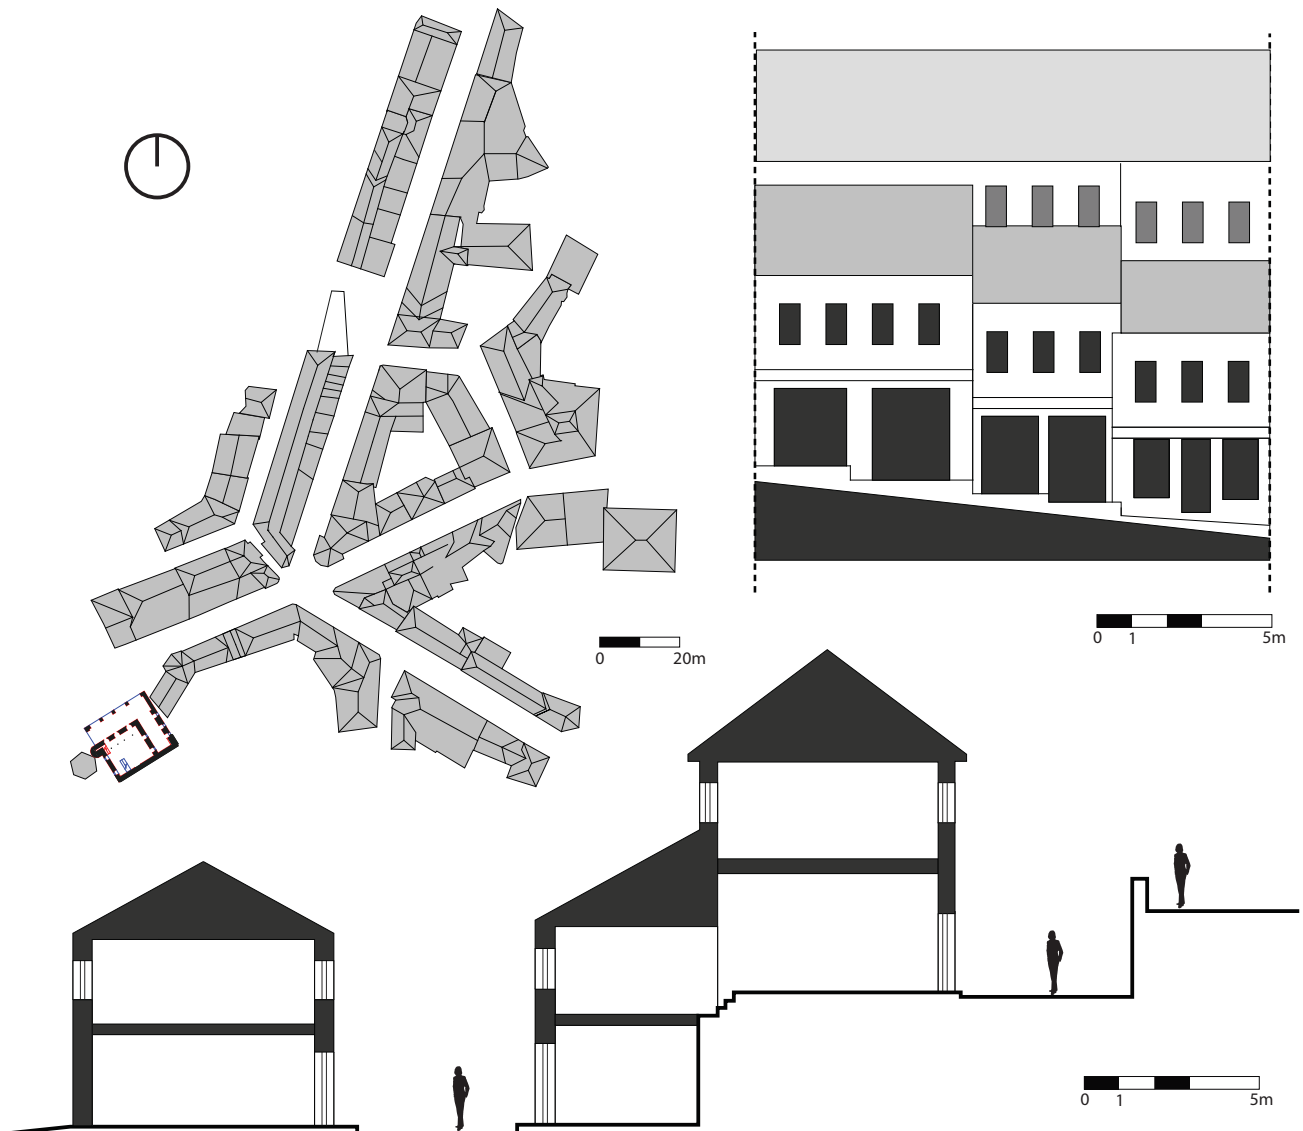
Plan of Gjirokastra bazaar. Scheme of a typical facade and section of the bazaar ( source: author's).
